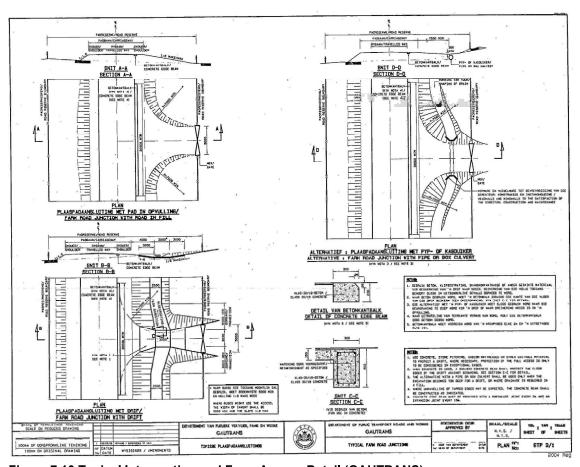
Typical Intersection and Farm Access Detail (GAUTRANS)
